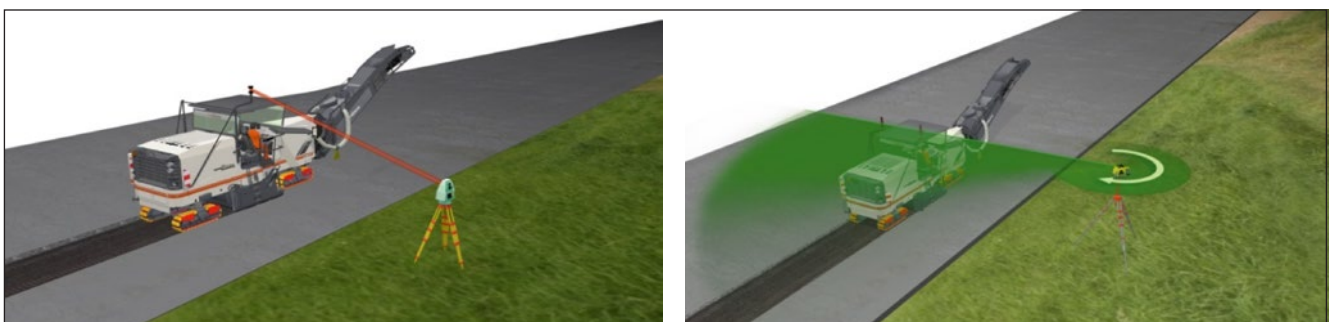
Schematic representation of milling machine control using 3D or laser technology (right) [37]
